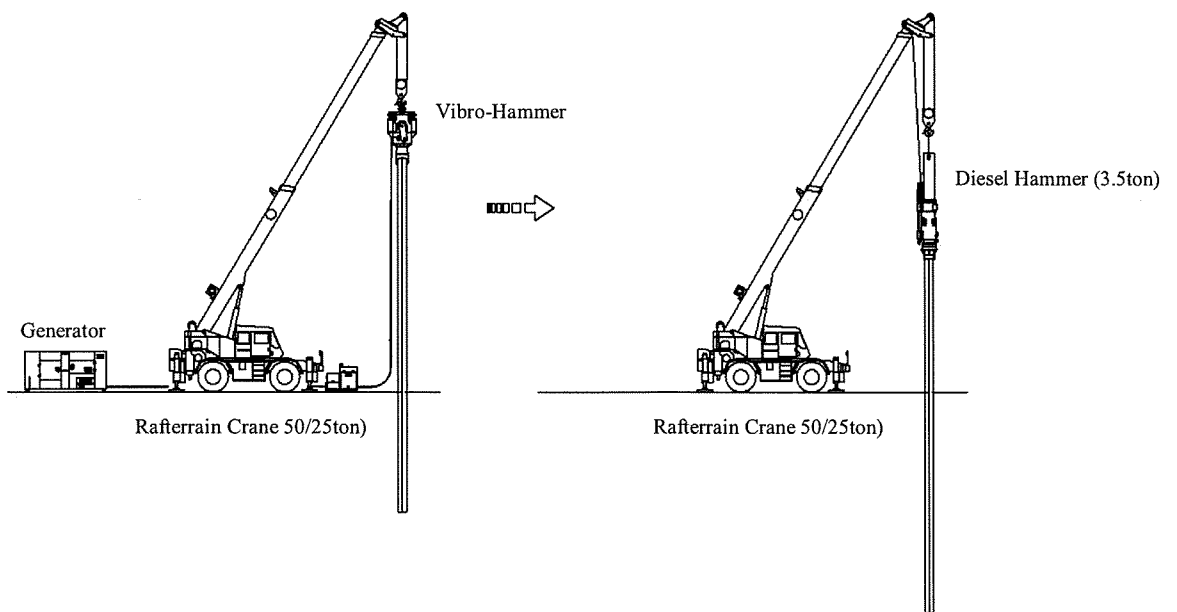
Pile Driving using Rafterrain Crane, Vibro-Hammer and Diesel Hammer
